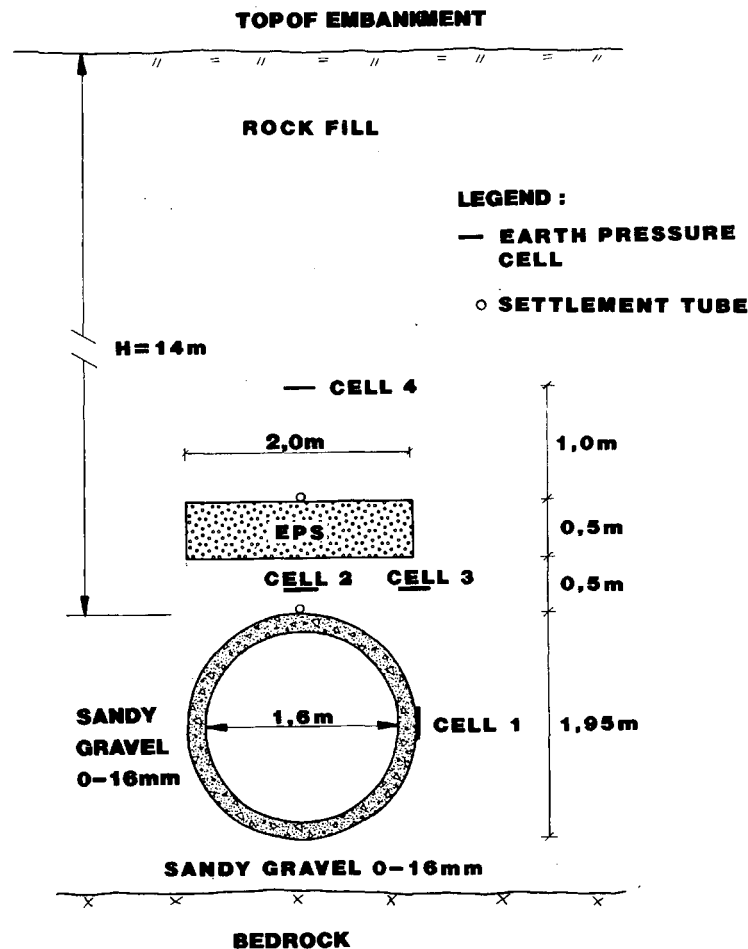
Geometry of instrumented cross section (Eidanger).
